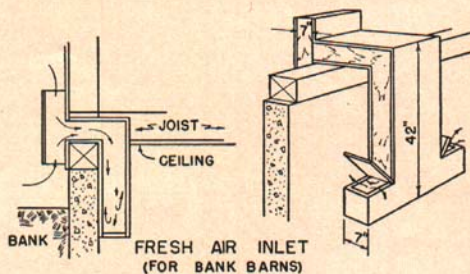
Construction of a fresh air inlet for a "bank" barn with masonry walls.
